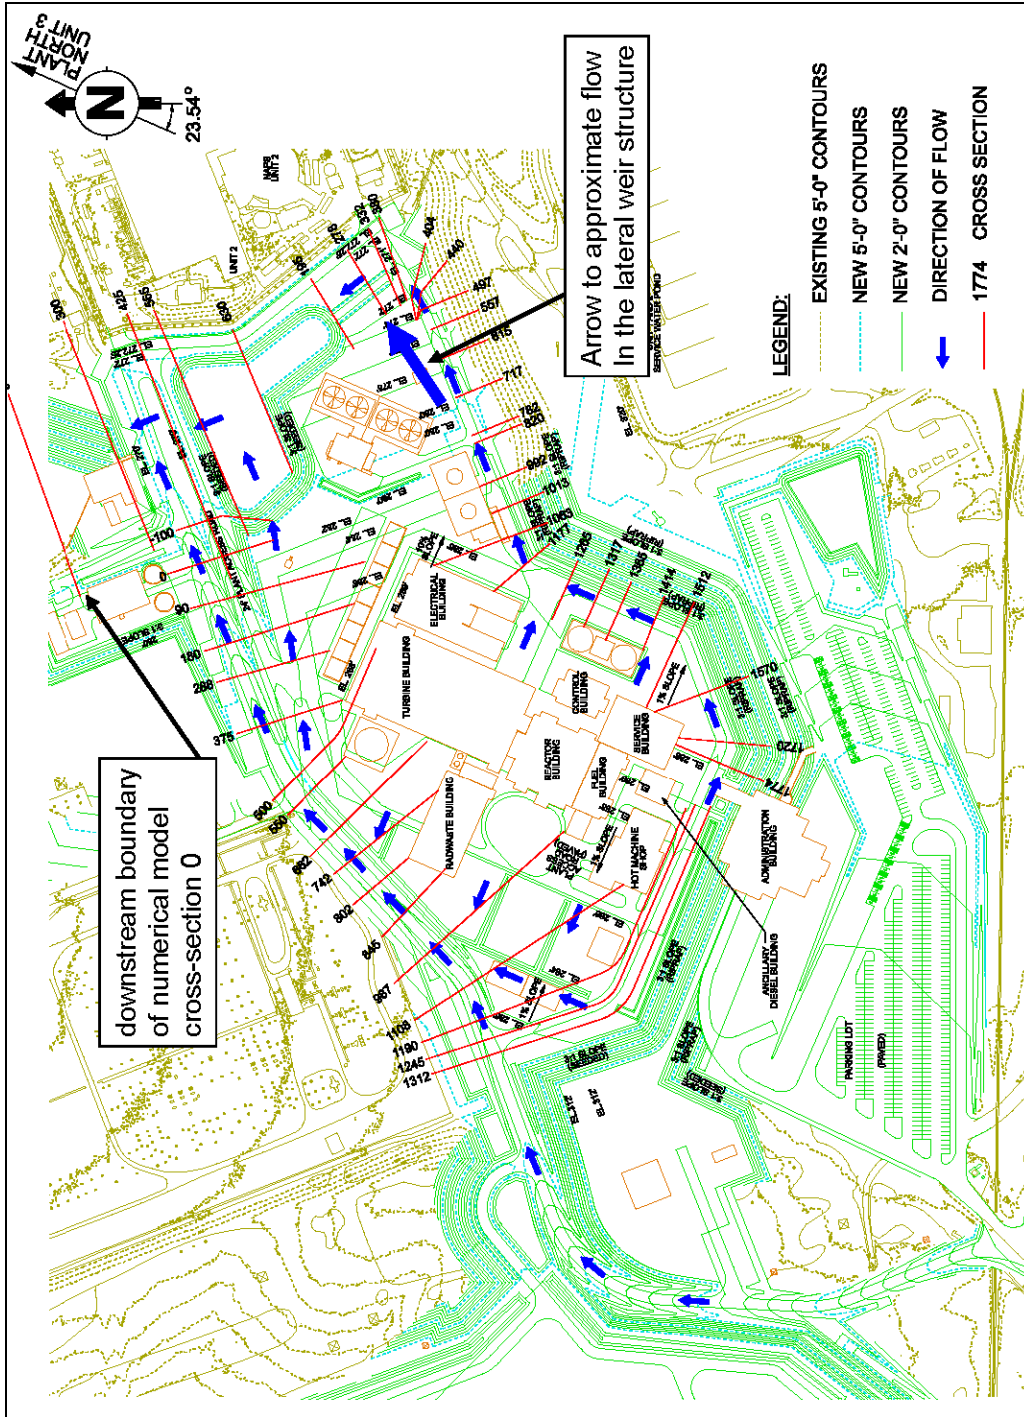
Site layout and HEC-RAS cross section locations
